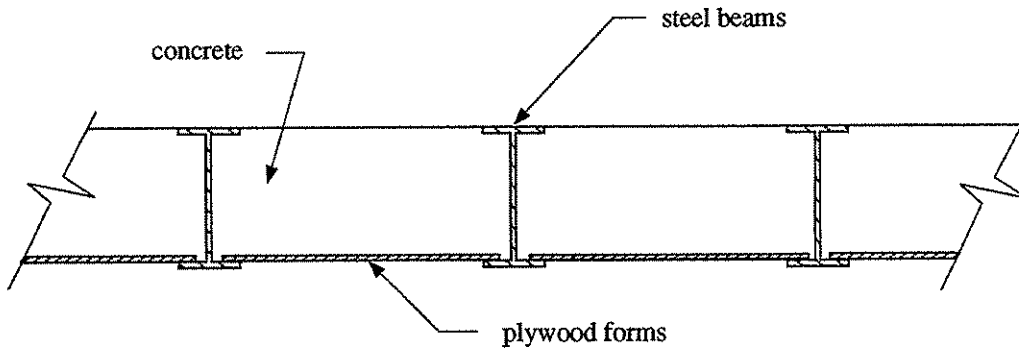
Sectional view of System 1 modified for narrow abutments.
